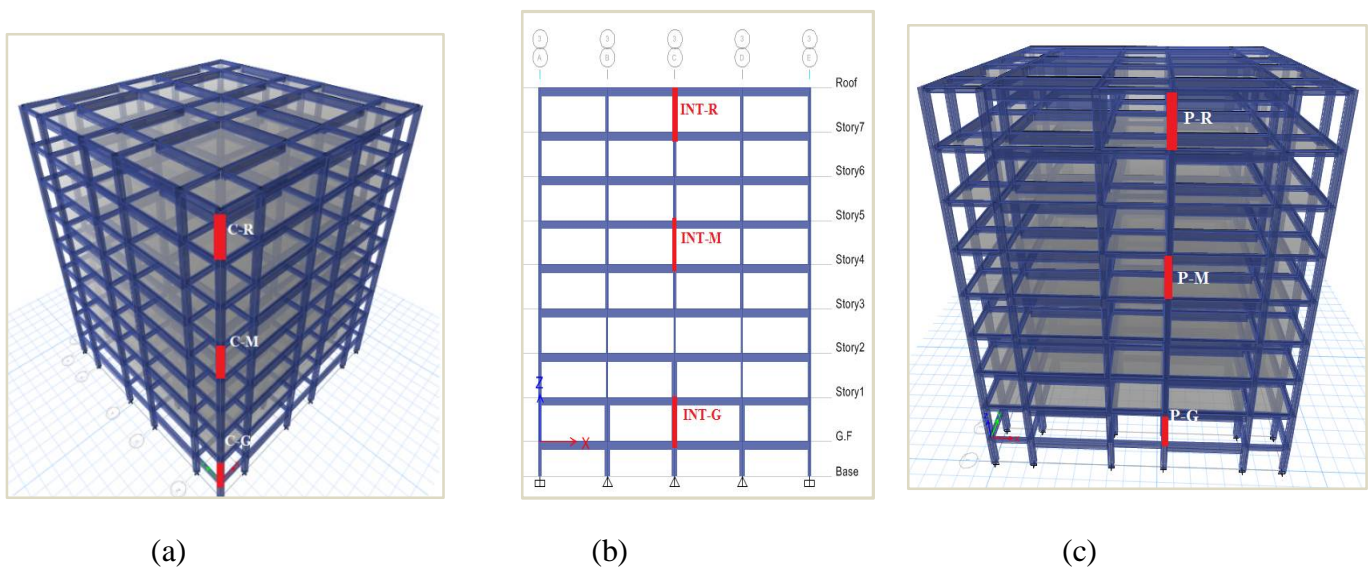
Column Removal Locations of Hypothetical Case Study Building (a) Corner column ,(b) Intermediate column and (c) Perimeter column
